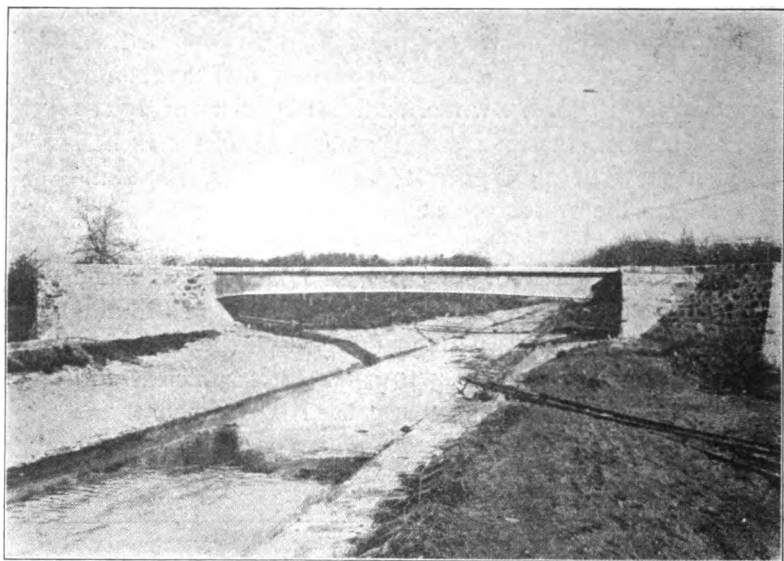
Reinforced Concrete Girder Bridge of 52 ft. span. Rubblestone abutments, girders slightly arched.
